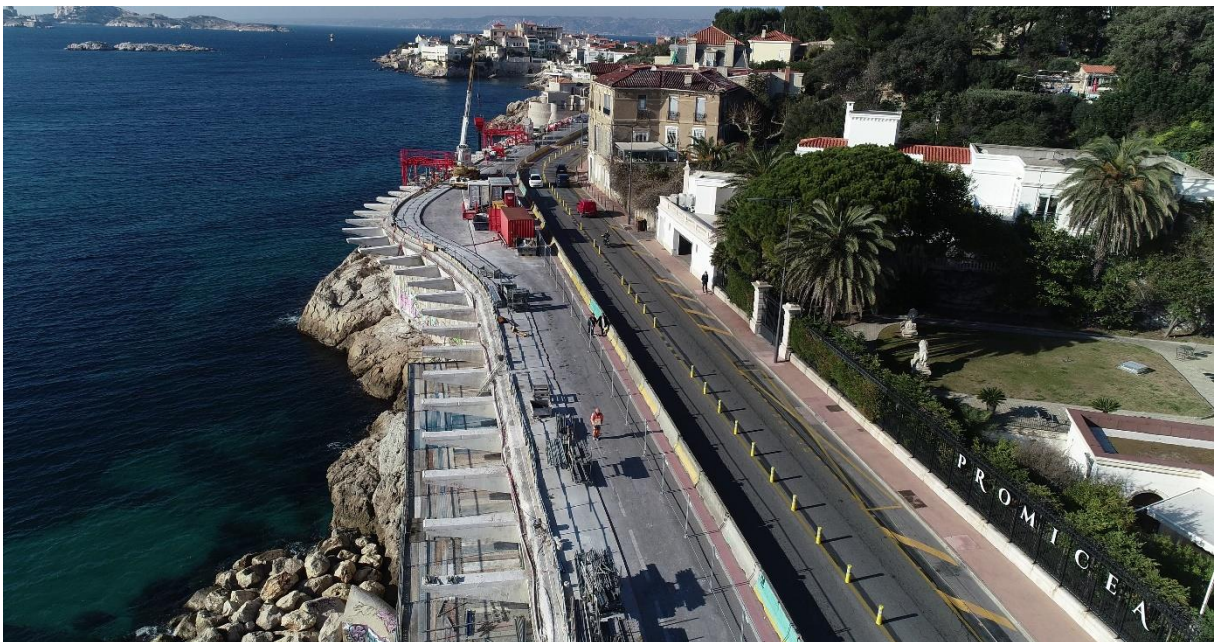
Reinforcement works with adaptation of the road traffic (2019)
